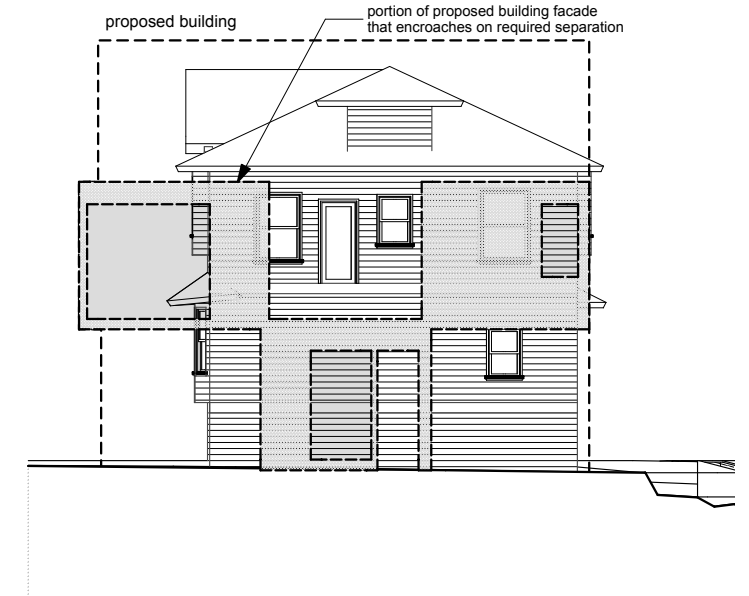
East Elevation of existing Single-family house demonstrates wall area that encroaches on Separation requirement
